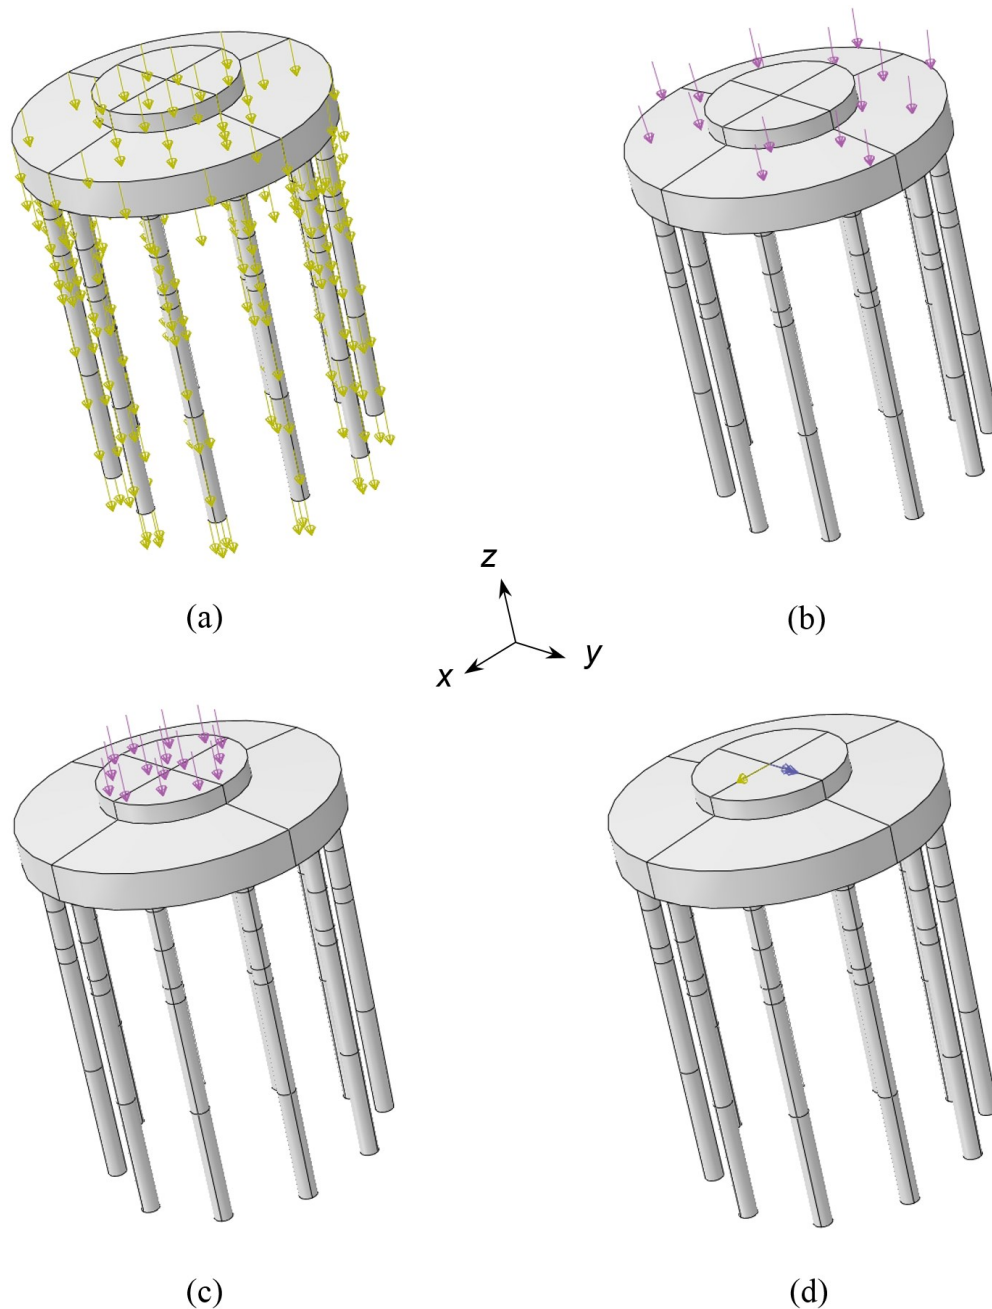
Loading steps: (a) raft and piles gravity; (b) backfill soil pressure; (c) vertical load; (d) horizontal load and overturning moment
